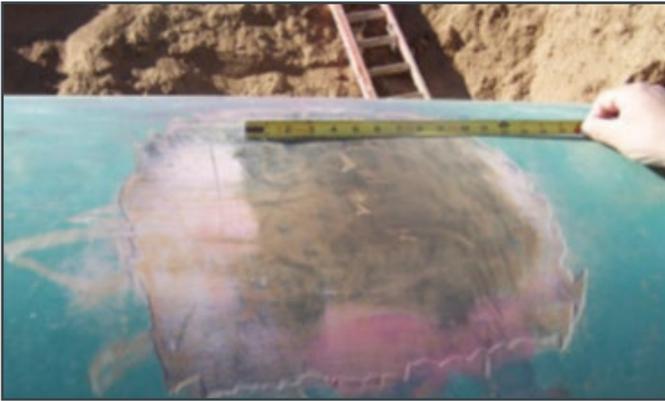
Gouge Defect inspected by a dye penetrant test and recorded
